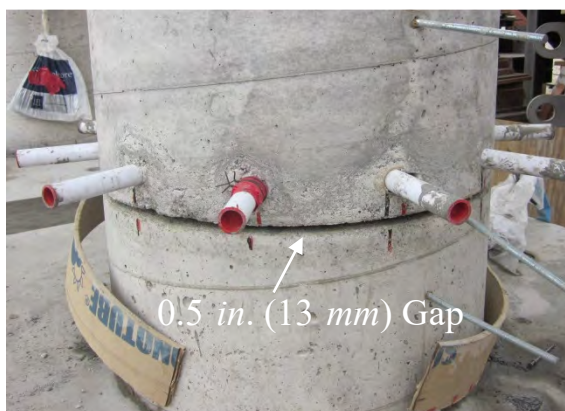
GCDP Precast Hollow Column w/ Embedded Sleeves
